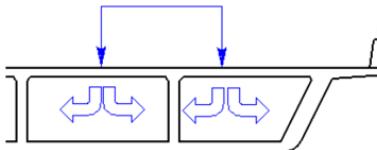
Truck Load Path from Deck Slab to Girders
